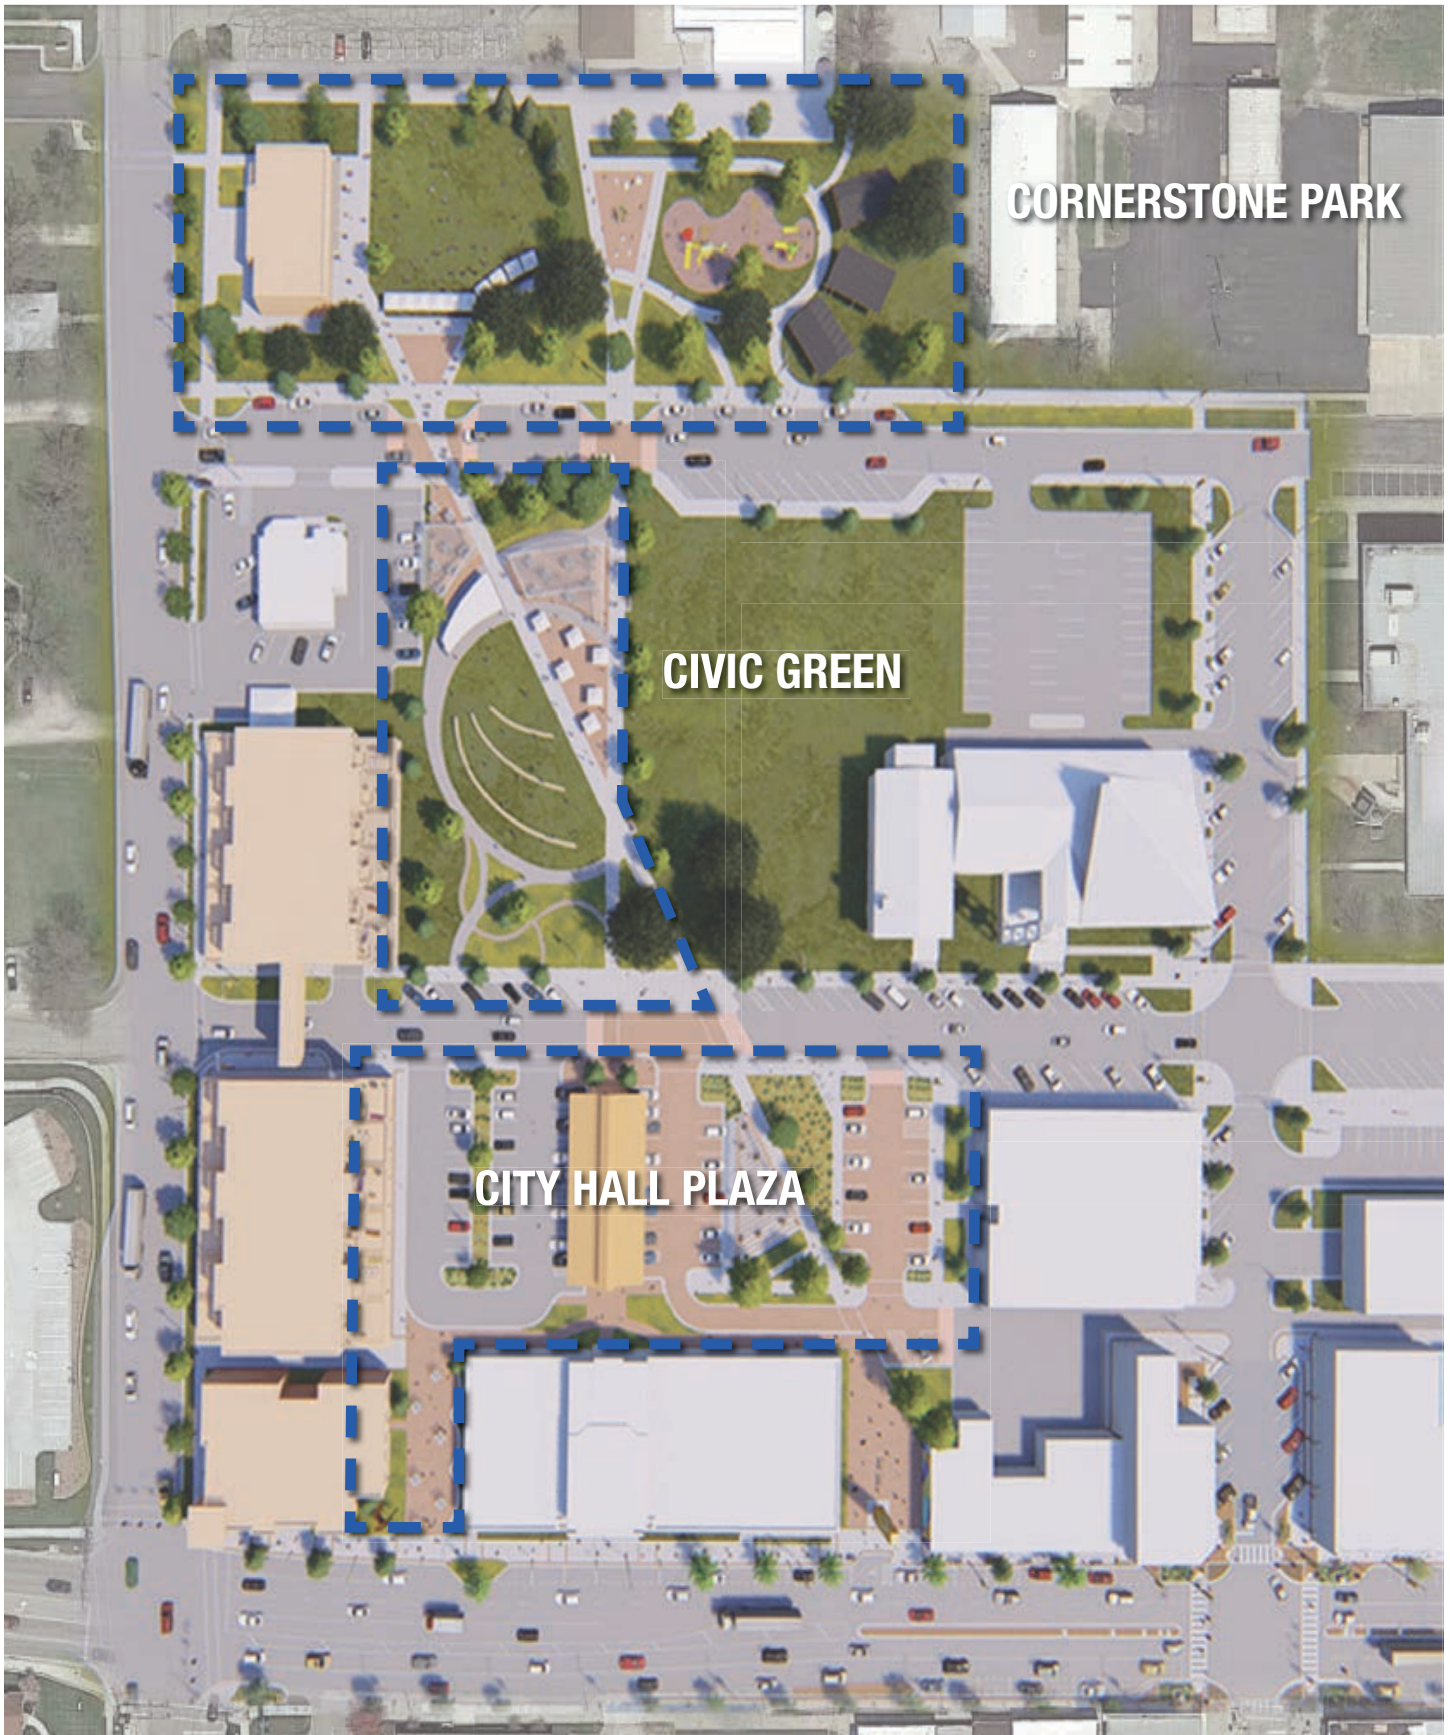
Figure XIV - Plan view of proposed public spaces in Downtown Gardner
